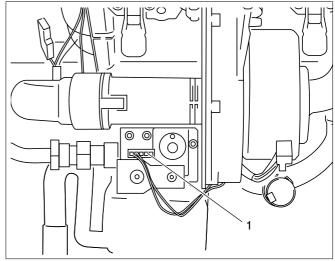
Checking the cable connections to the gas control valve (e.g. HONEYWELL gas control valve)
